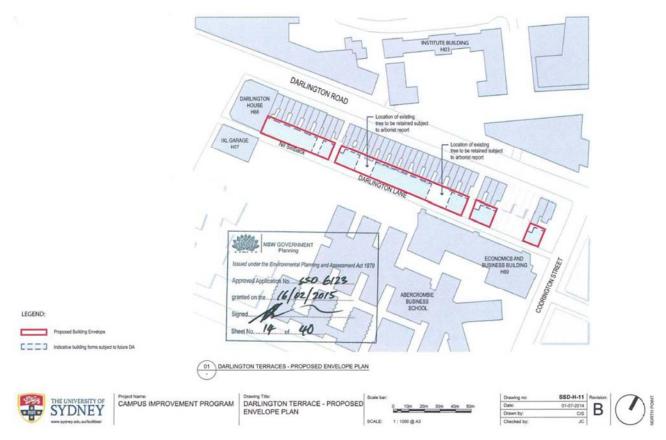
Darlington Terraces – Proposed Envelope Plan
